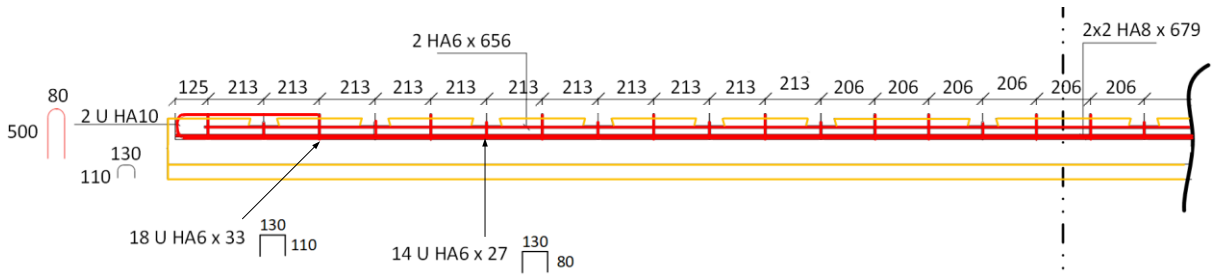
Details of the steel rebars cage used in the beam specimen.
